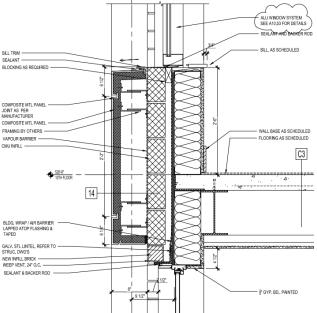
Section through typical exterior wall in addition. From 4A.21.
